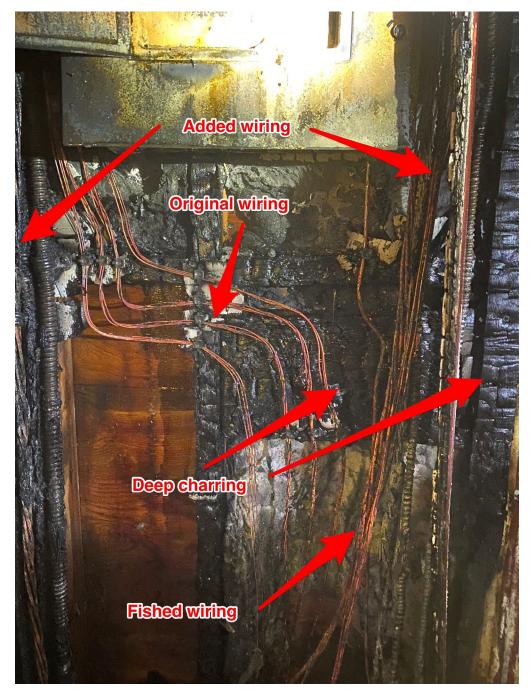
Lower wall area provides evidence of the deepest charring of the wall and damage to electrical cabling. There is evidence of a combination of original wiring strapped in position as well as multiple added 'fished' cabling installed. Fished cabling added seems to include non-metallic sheathed and metal armoured cables. Sections of armoured cabling seems to have armour damage.
